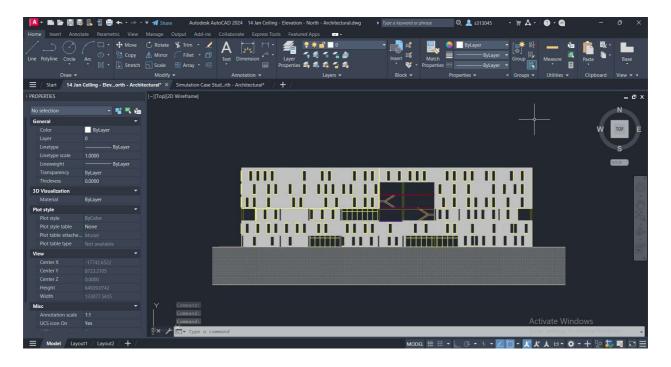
North Elevation in AutoCAD before editing, Elaborated by Authors
